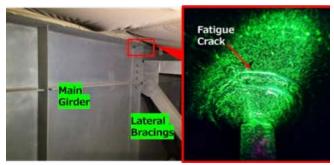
(c) Fatigue crack (main girders with lateral bracings)
